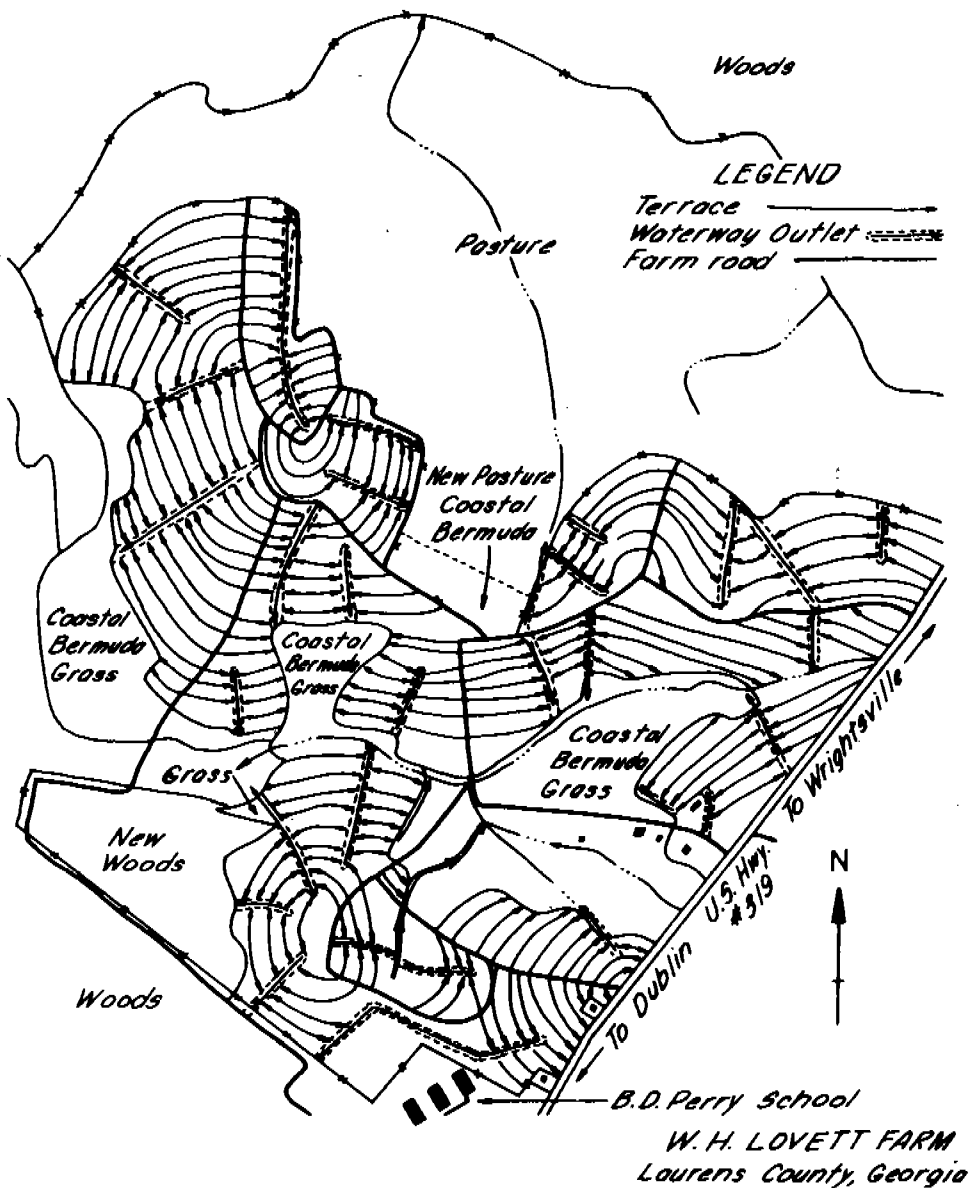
Illustration of good farm road layout and land use fitted into a terrace system
